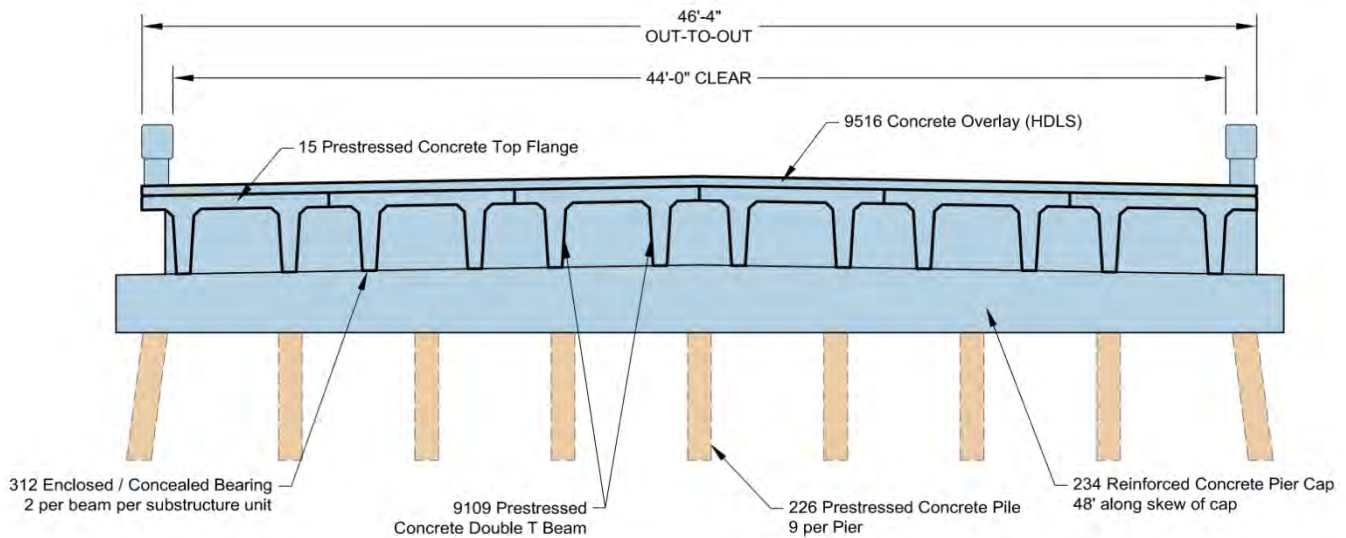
EI.24.7- 2: Plan view of continuous prestressed concrete Double T Beam bridge
